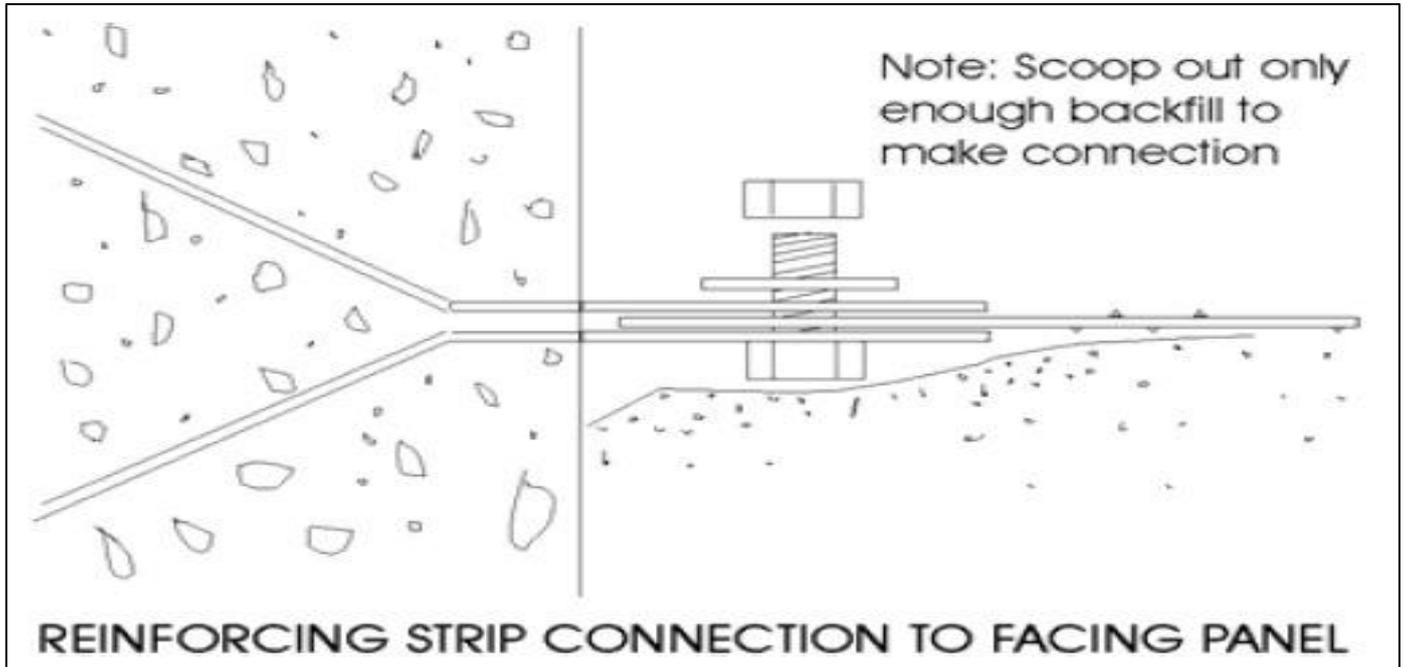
Connection of Reinforcing Strips to the Facing Panels (Bailleul Guillaume and Laga Matthias 2017)
